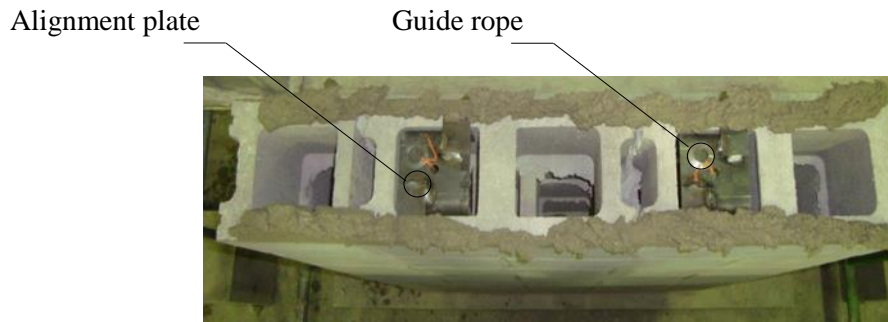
Reinforcement alignment plates used in specimens with unbonded reinforcement: restraints fabricated from steel plates embedded within the wall section
